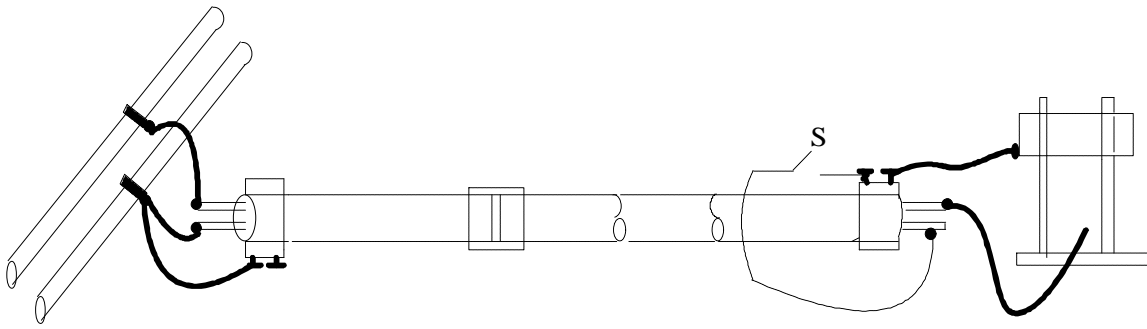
Illustration of Installation and Connections for One Steel Conduit With Two Enclosed Conductors.
